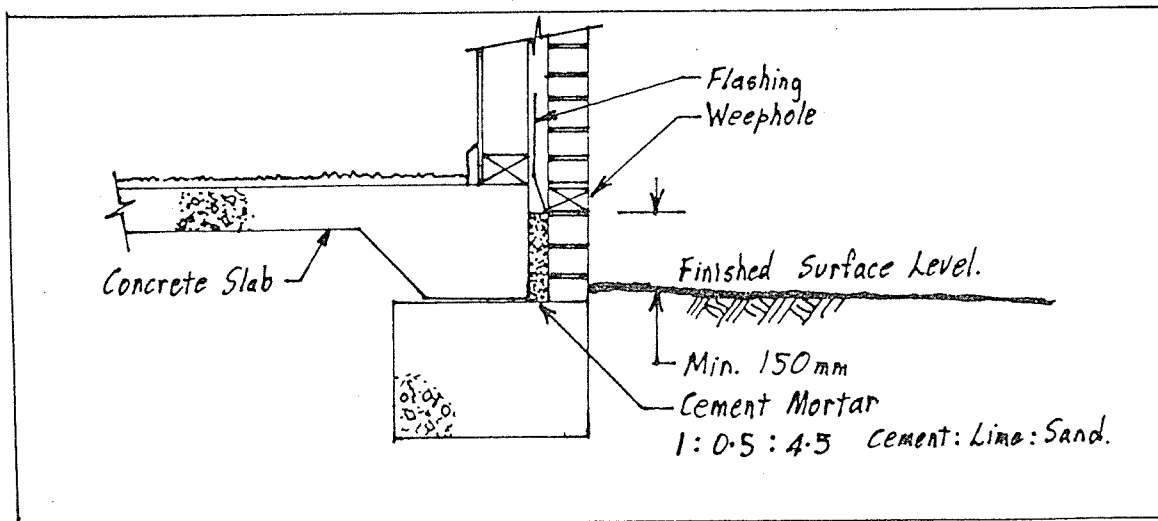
SLAB EDGE DETAIL - Mortar Barrier
